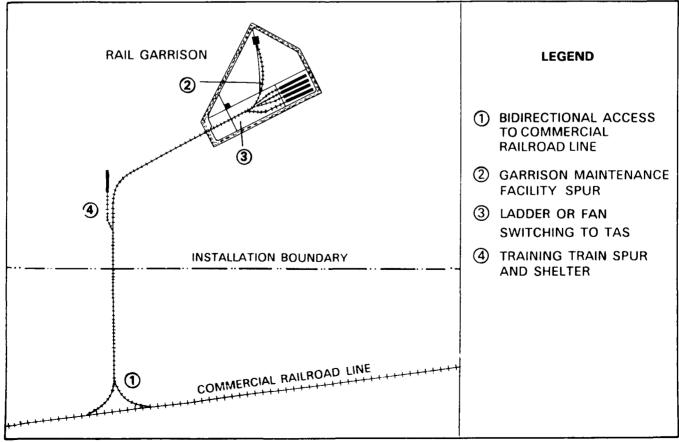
TYPICAL RAIL NETWORK CONNECTING GARRISON FACILITIES TO THE COMMERCIAL RAILROAD LINE
